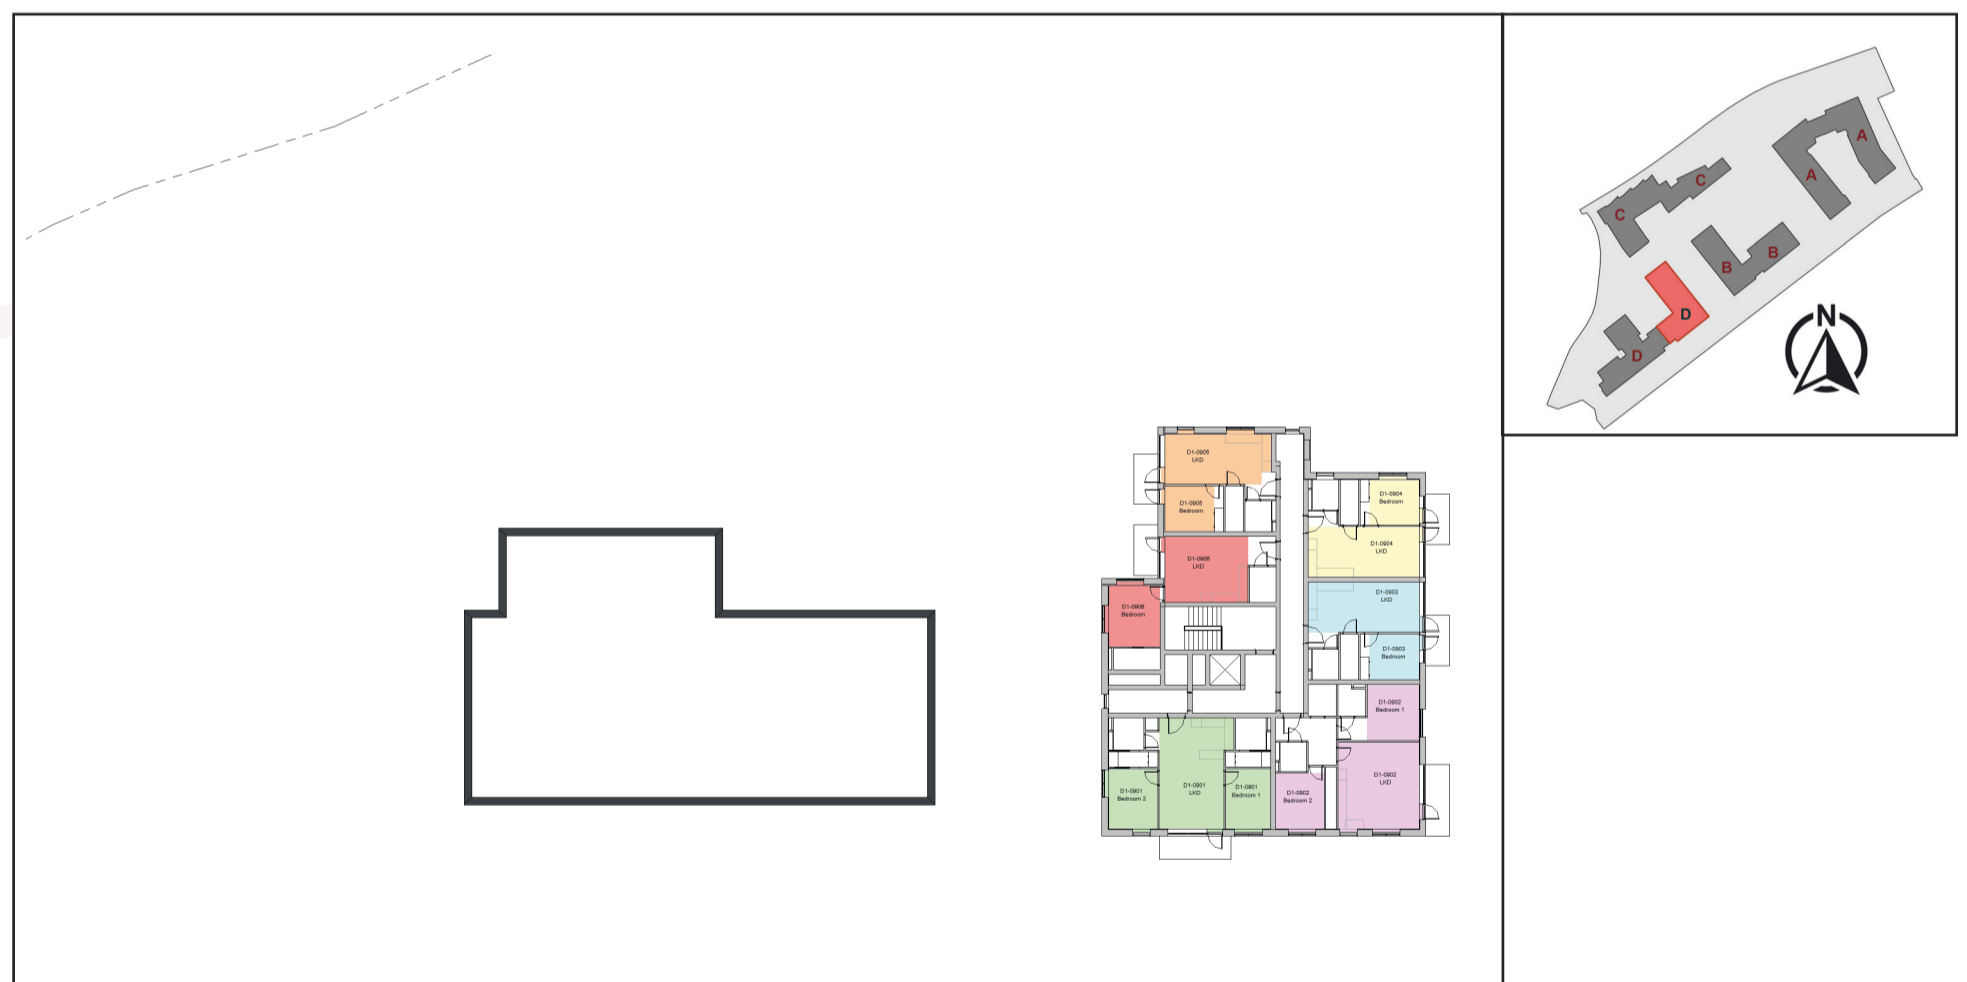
Floor plan of assessed building (L), Keyplan highlighting the assessed building (R).
